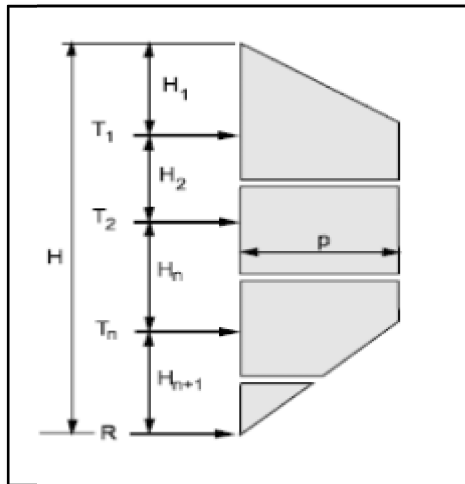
Calculation of Anchor Loads for Multi - Level anchored Wall
